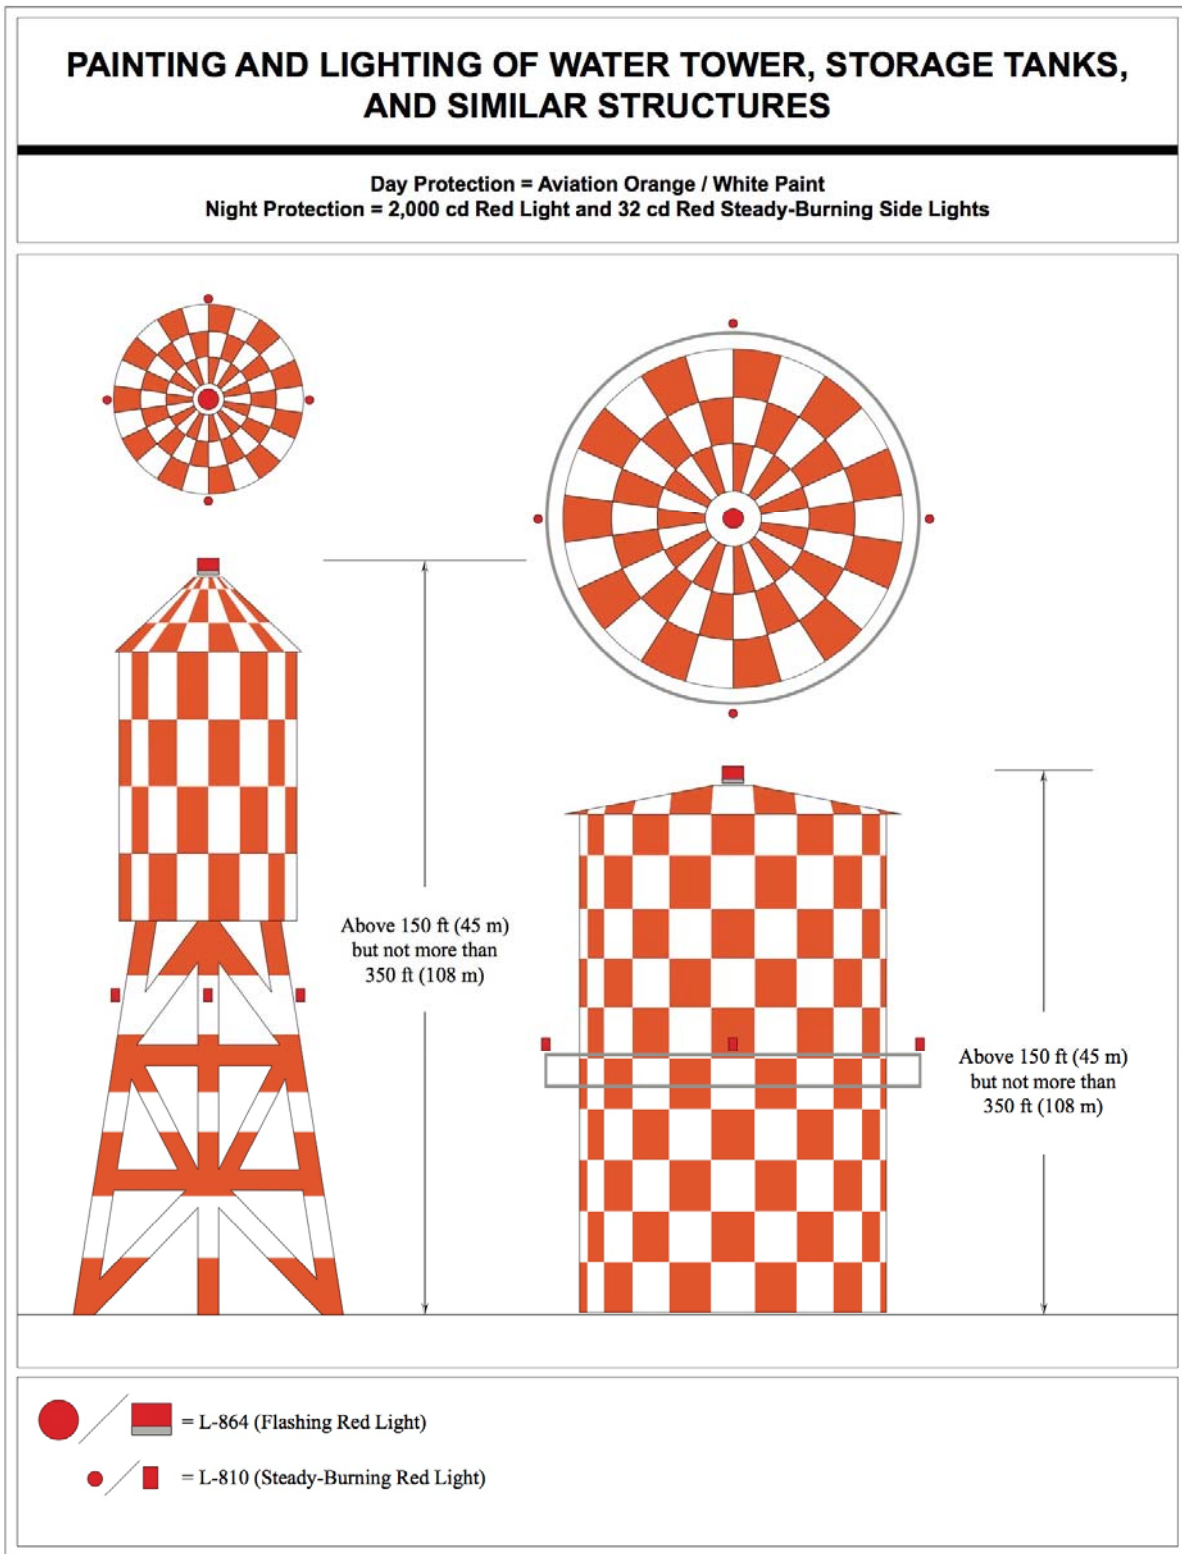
Painting and Lighting of Water Towers, Storage Tanks, and Similar Structures
